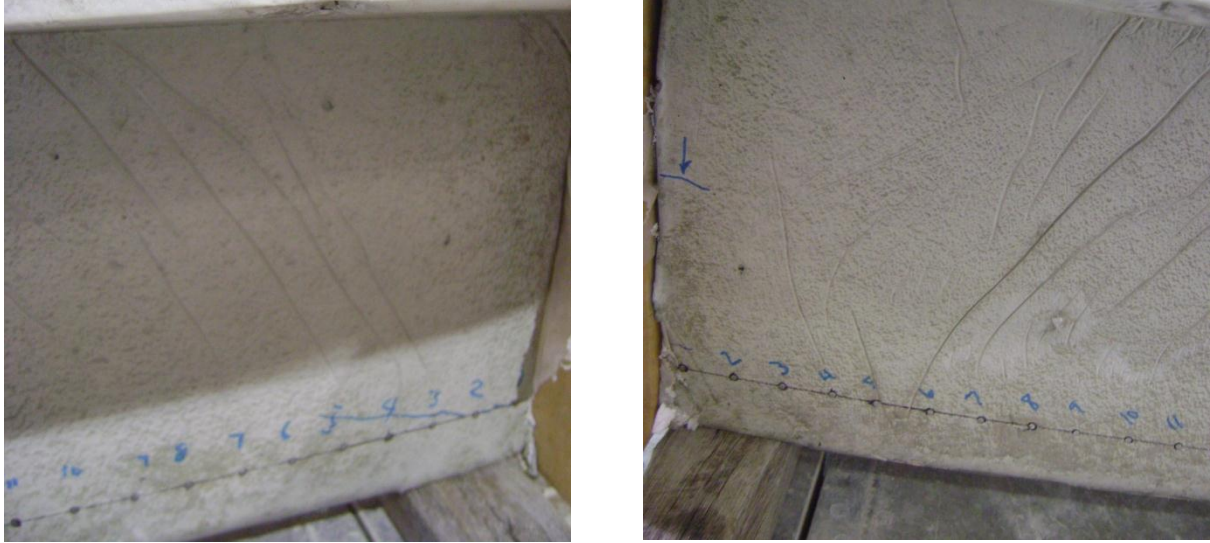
North girder end zone cracking at two sides (no visible cracks)
